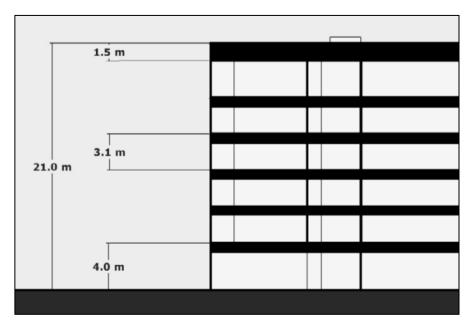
Diagrammatic section depicting possible floor to floor configurations for a building measuring 21m in height
